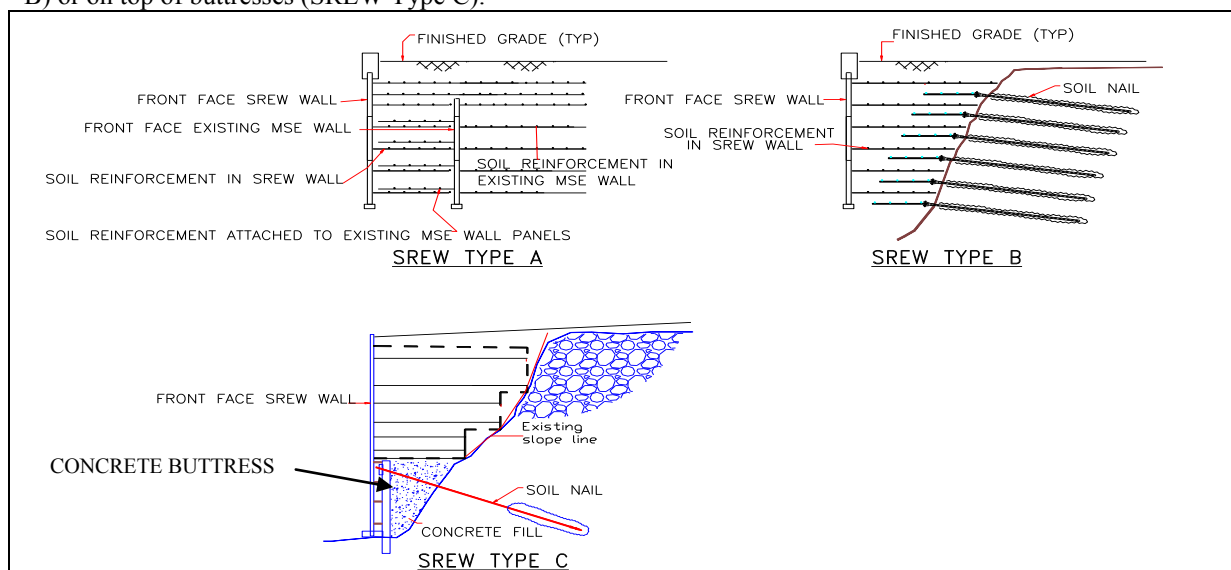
Common SREW walls configurations: Type A for SREW in front of a MSE wall, Type B for SREW in front of existing soil nail shoring, Type C SREW fronting a concrete fill buttress.
